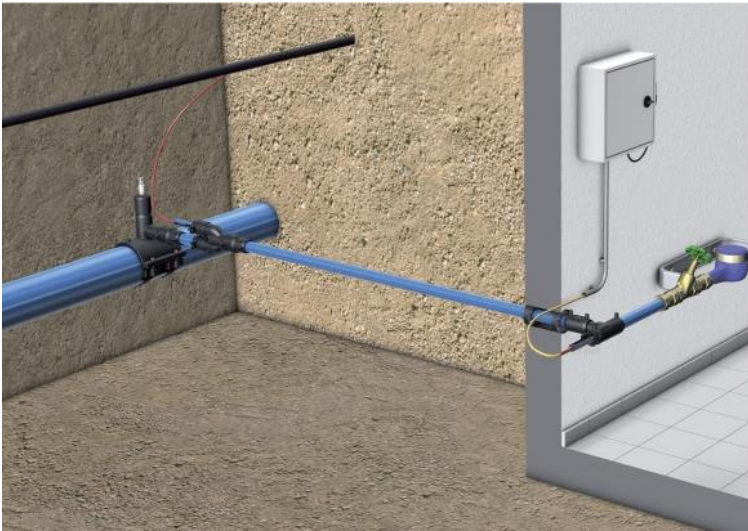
The duct containing the fibre cable enters the building inside the drinking water pipe.
